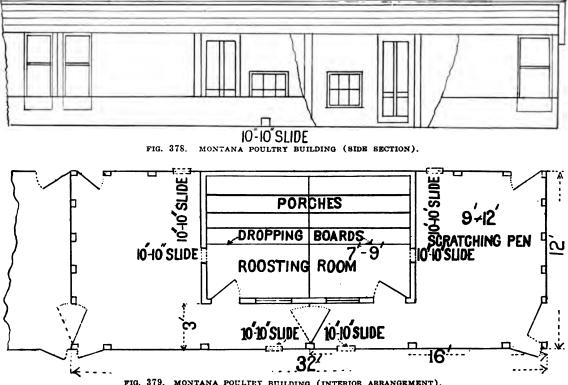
MONTANA POULTRY BUILDING (INTERIOR ARRANGEMENT).
